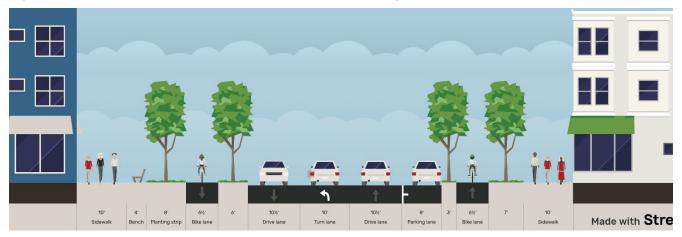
East-West Highway Between 16th Street and Blair Mill Road, Looking East
